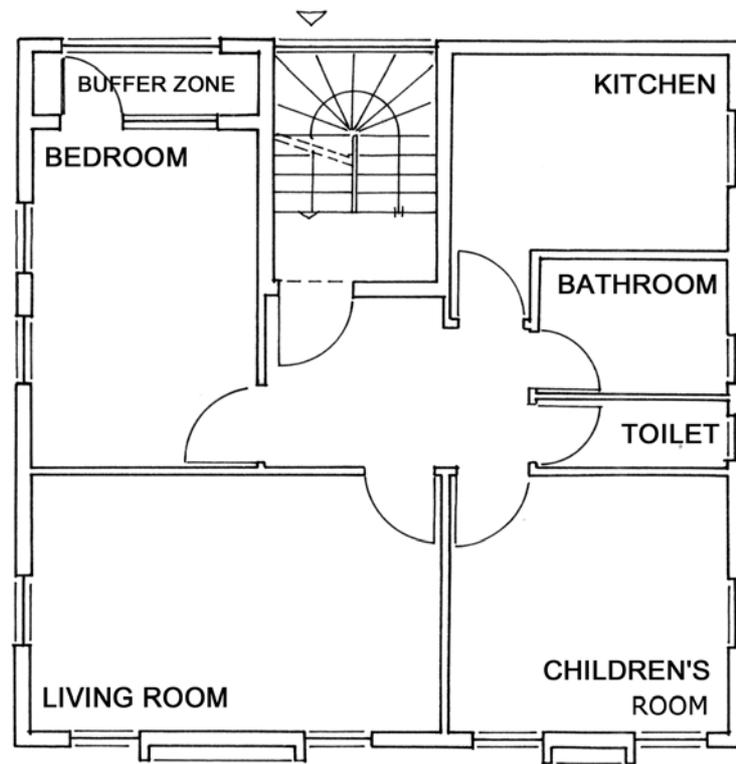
Plan of type S₄ dwelling (multi-storeyed housing facing mainly south); Scale 1/100
